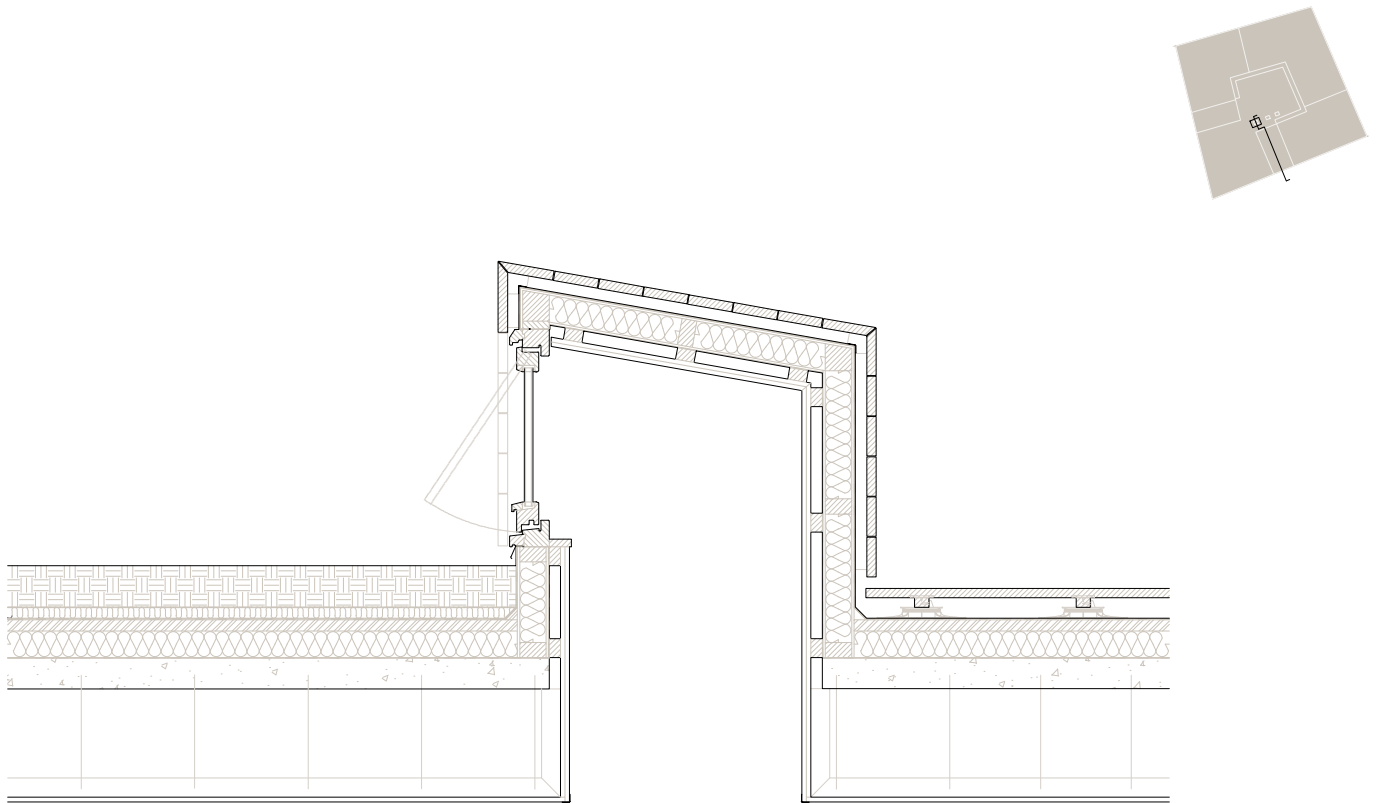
Detail 4: Terrace wooden flooring connection with entrance door to apartments 1:20
